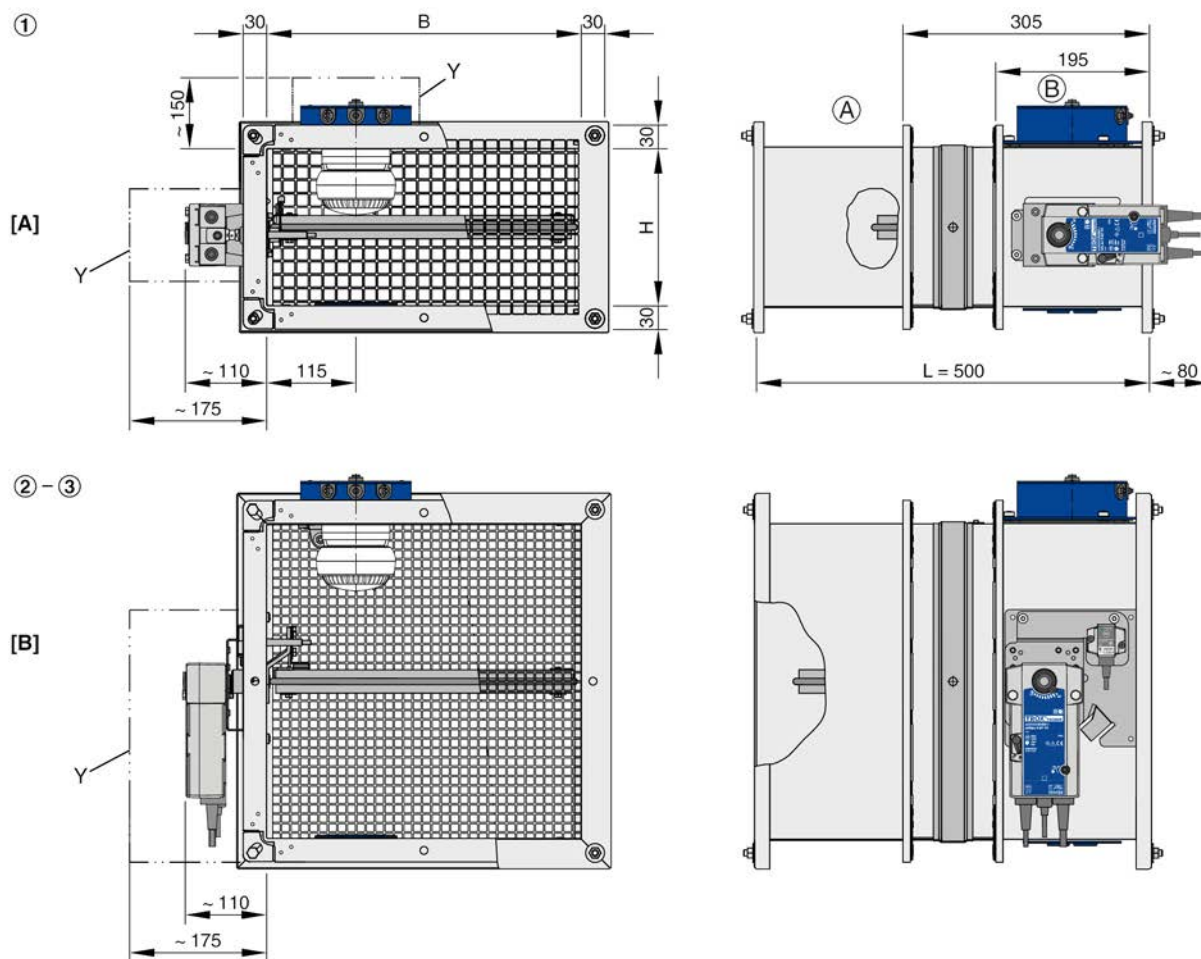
FKA2-EU with spring return actuator and duct smoke detector used as an air transfer damper
